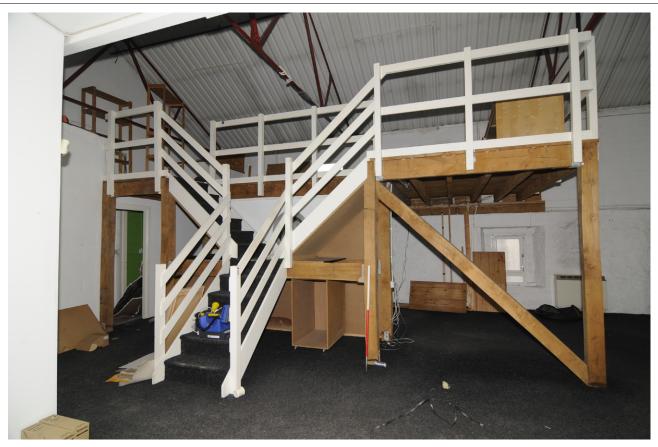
Timber-framed mezzanine on the second floor in Building H, (Room H1)
